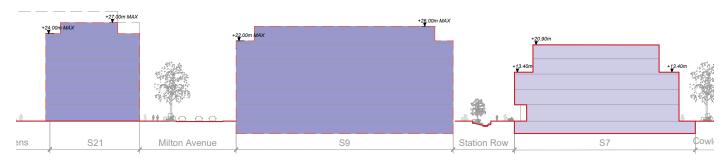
Parameter Section BB' - Building S9 east-west parameter section (south side)
